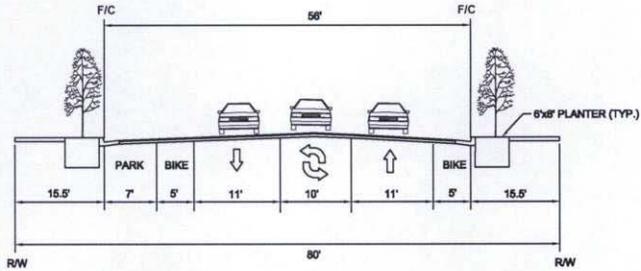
6th Street UPRR to Railyards Blvd. (looking north)
